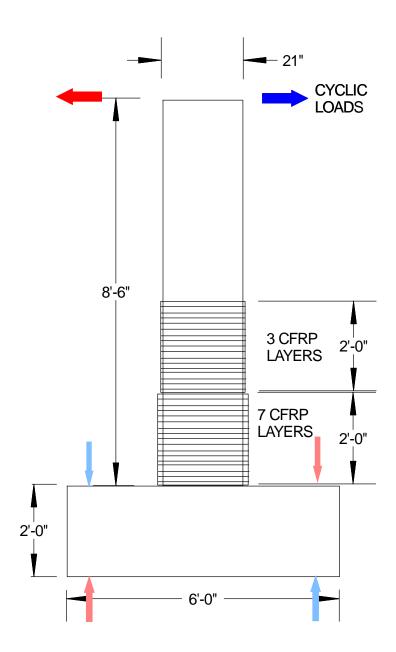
Seismic Retrofit of the column to footing joint using NMB splice sleeves.
